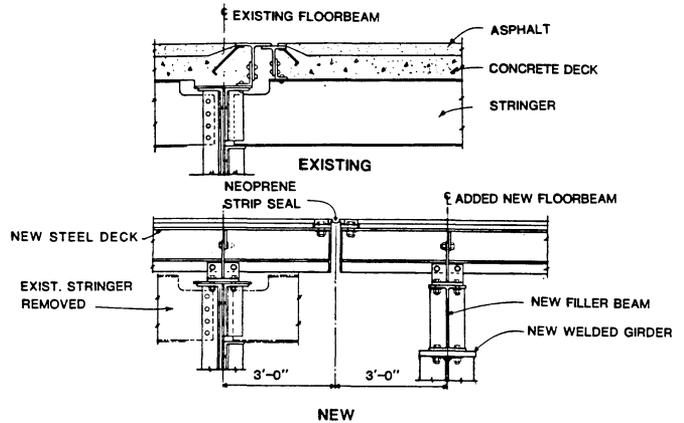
Ben Franklin. Deck joints in approach girder spans
